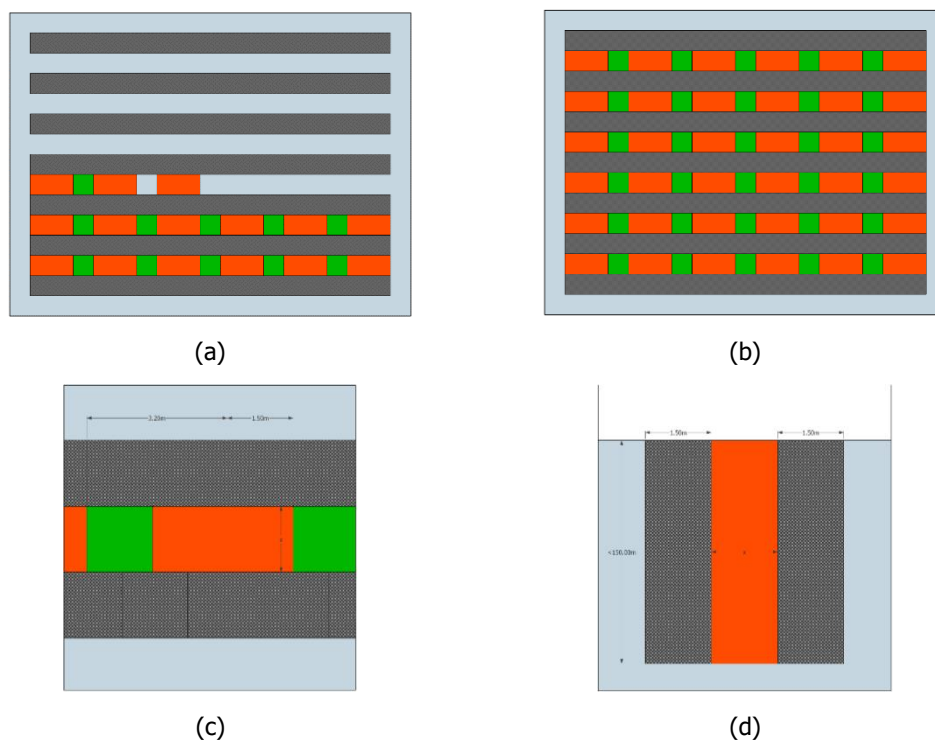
Schematic layout of the backfilling scenario, (a) top view of intermediate step in cutting sequence after trenches cut in phase 1 have been backfilled, (b) top view of complete backfill layout (c) close-up of top view and (d) close-up side view
